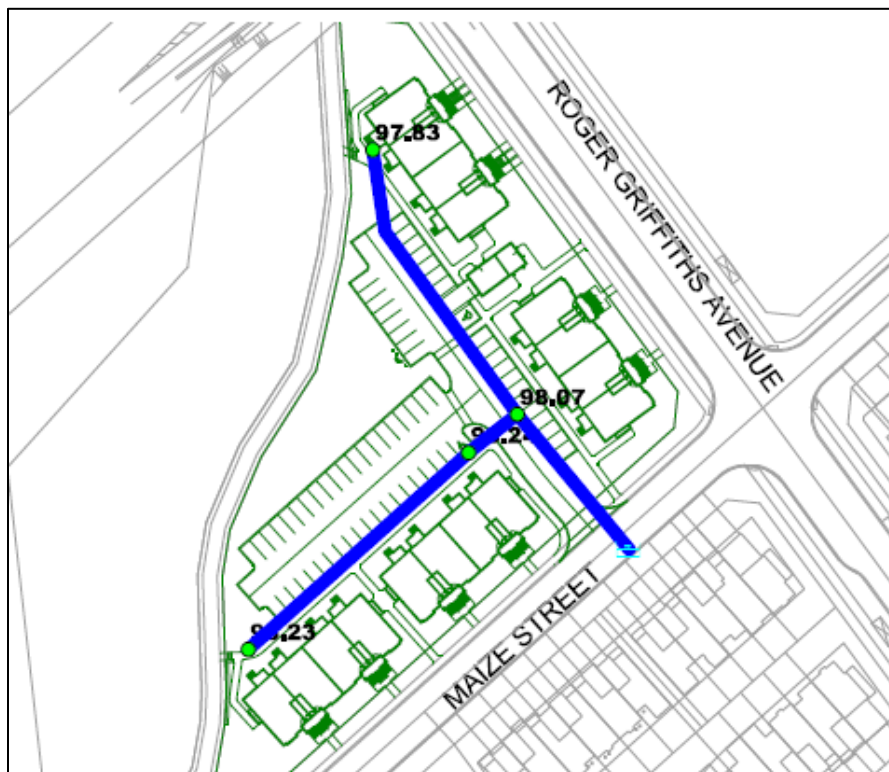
Proposed Watermain Layout and Pipe Diameters (mm)
